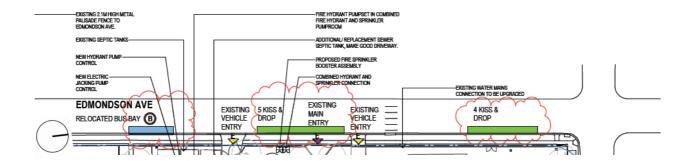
Extract from overall site plan showing kiss and drop bays on Edmondson Avenue (Source: Pedavoli Architects)
